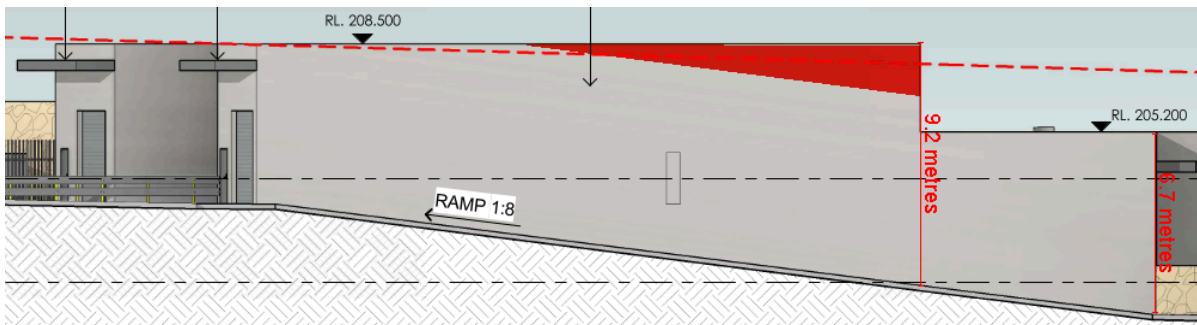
The proposed breach to the maximum wall height control, on the southern elevation of the garden centre storage and staff office building (as marked in red)
